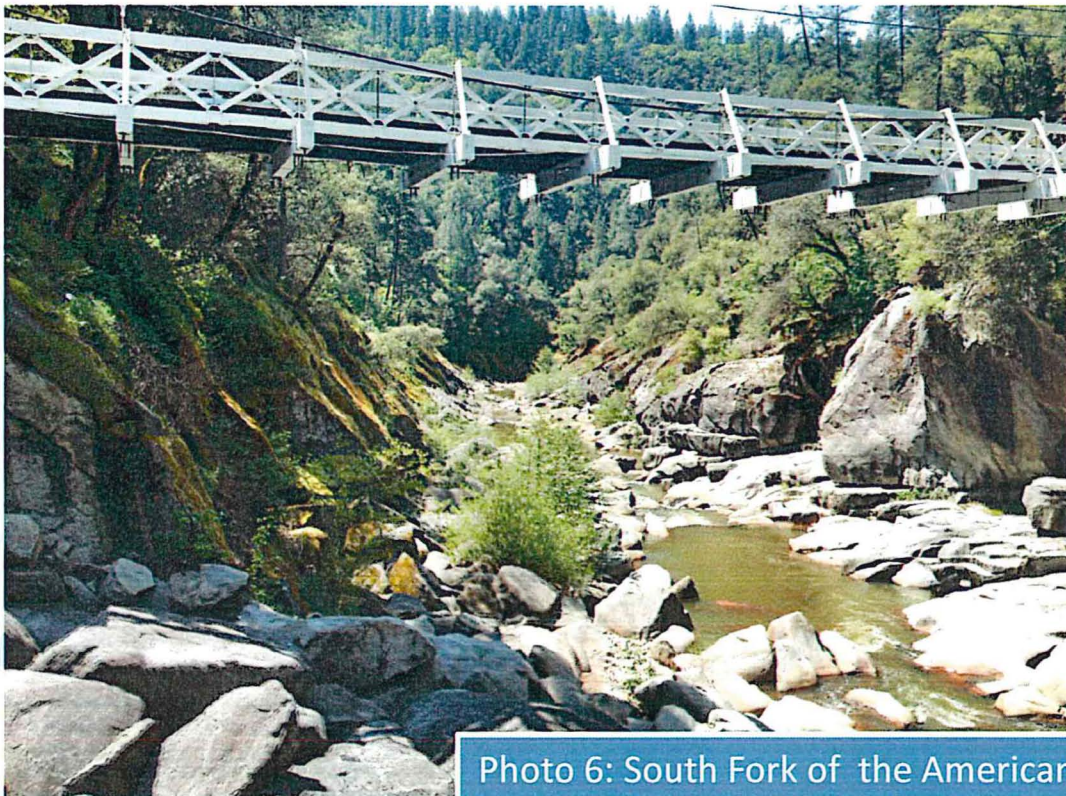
South Fork of the American River at Mosquito Bridge looking east
